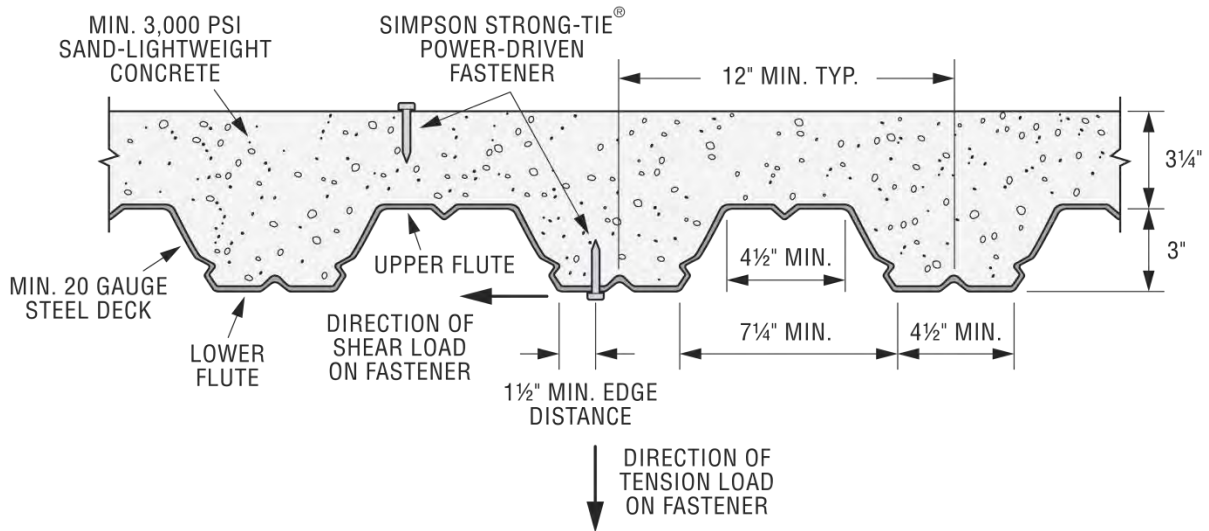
INSTALLATION IN 3 1/4-INCH CONCRETE FILL OVER 3-INCH-DEEP STEEL DECK
